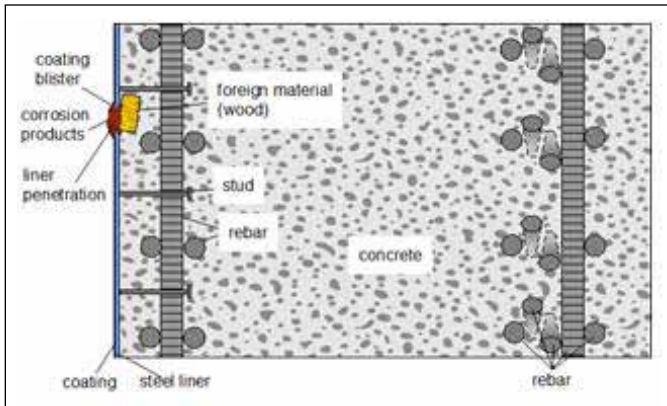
Schematic showing a cross-section of a reinforced concrete containment structure with embedded foreign material from original construction and corrosion penetration of the steel containment liner
